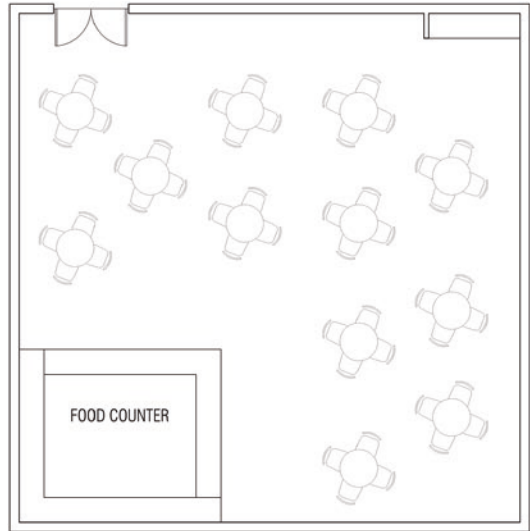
Sample layout drawing of the cafeteria in entrance lobby
